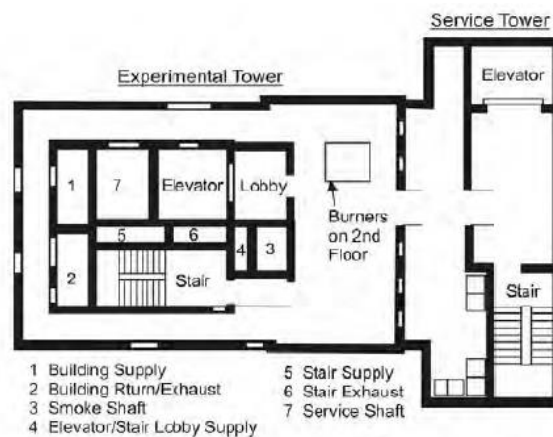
The NRCC Experimental Fire Tower. Typical floor plan. Image extracted from [8].
